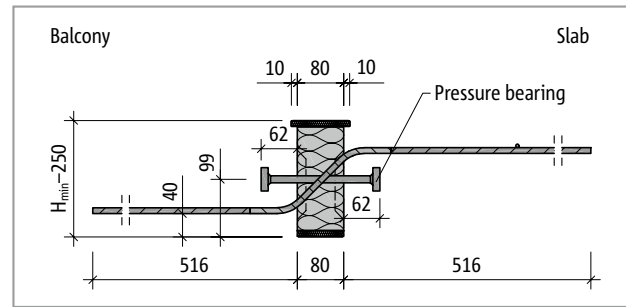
Schöck Isokorb® T type Q-P-V4: Product section
